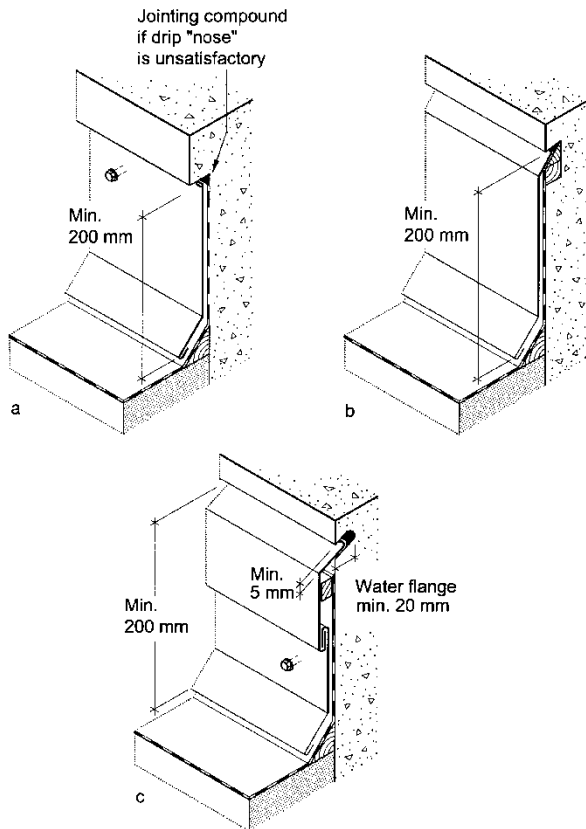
Recommended designs of a connection to a concrete wall. Variant (c) is evaluated as being the safest against water ingress
